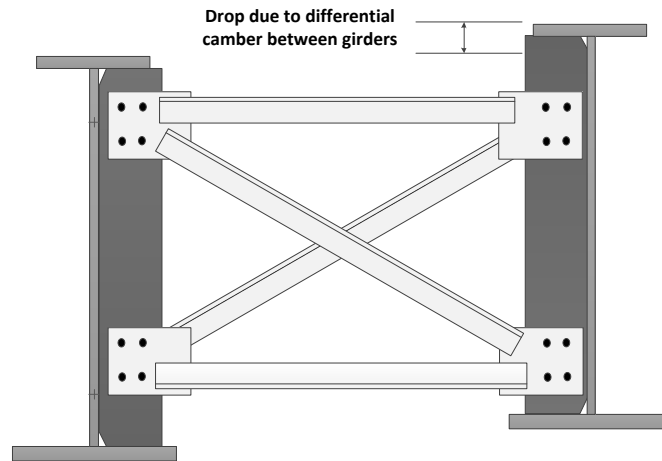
Illustration of the detailing the connection plates differently based on the differential cambers between the girders for No-Load Fit (NLF) detailing
